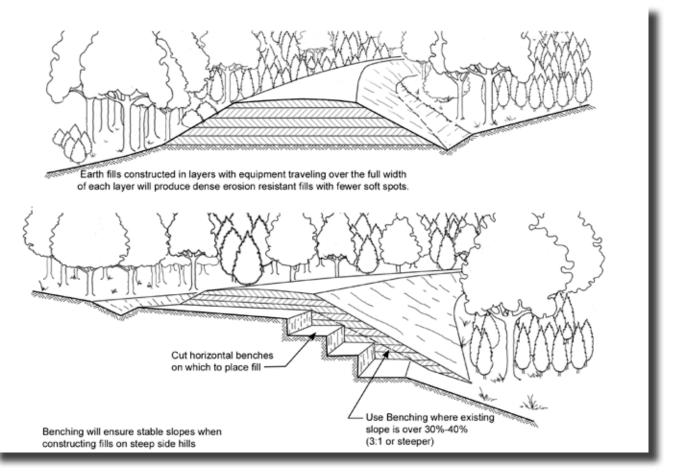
Fill construction options typically using layer placement (Used with permission Nova Scotia Roads 2004).
